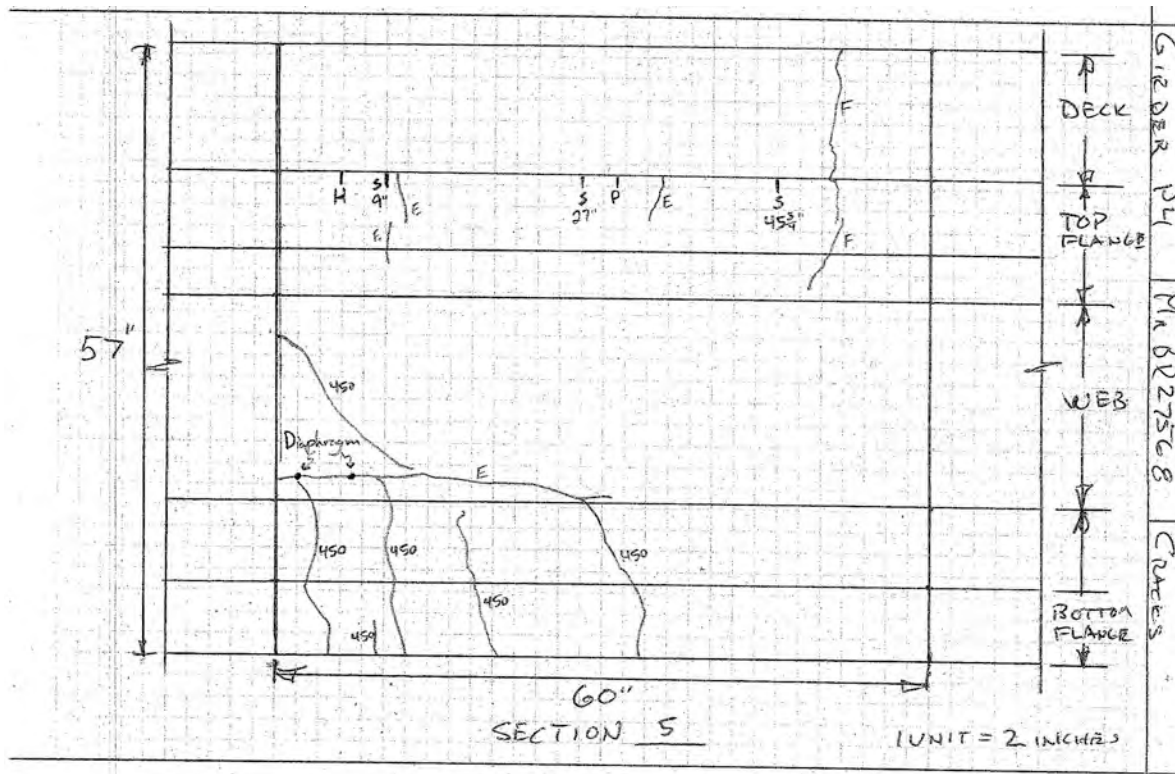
Girder P4 crack pattern – Section 5
